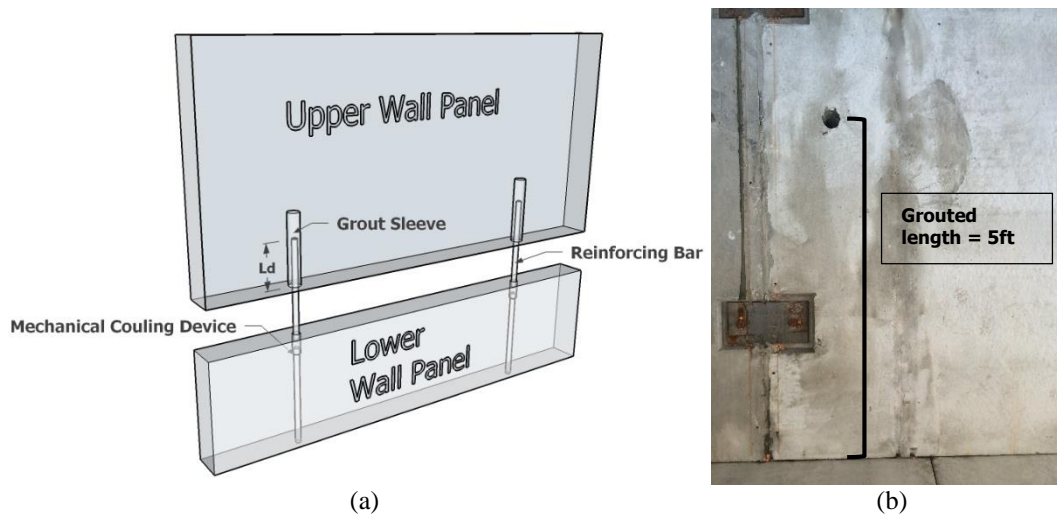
Illustration of (a) grouted reinforcing bar connection, and (b) grouted bar in conduit connection in shear walls of residential building (obtained with permission from Stubbe's Precast)
